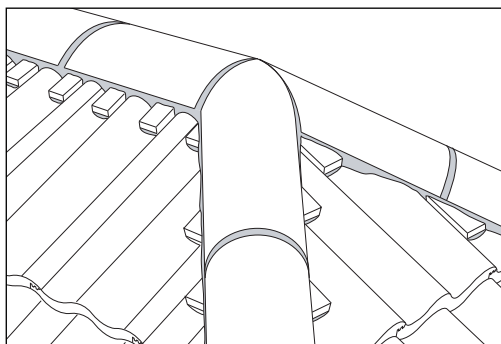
At ridge hip junction, cut tiles with three-way mitre to ensure continuous line
